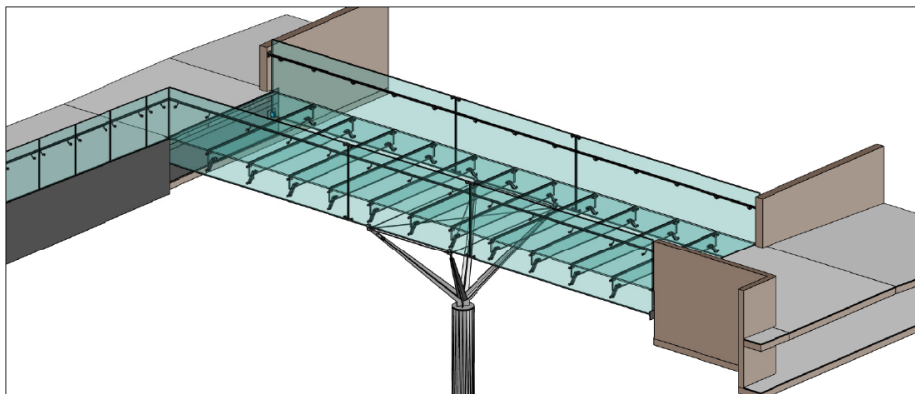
Glass Bridge – “Eaton Center”, Calgary
